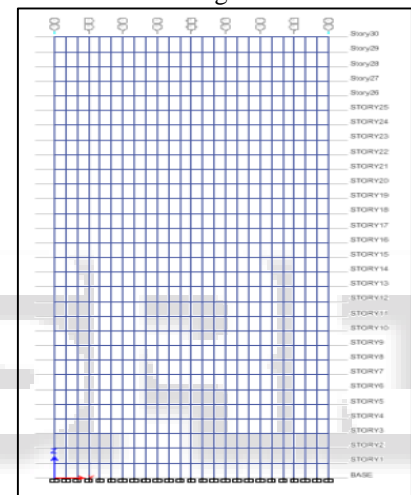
2D Elevation of Tubular Steel Structure
